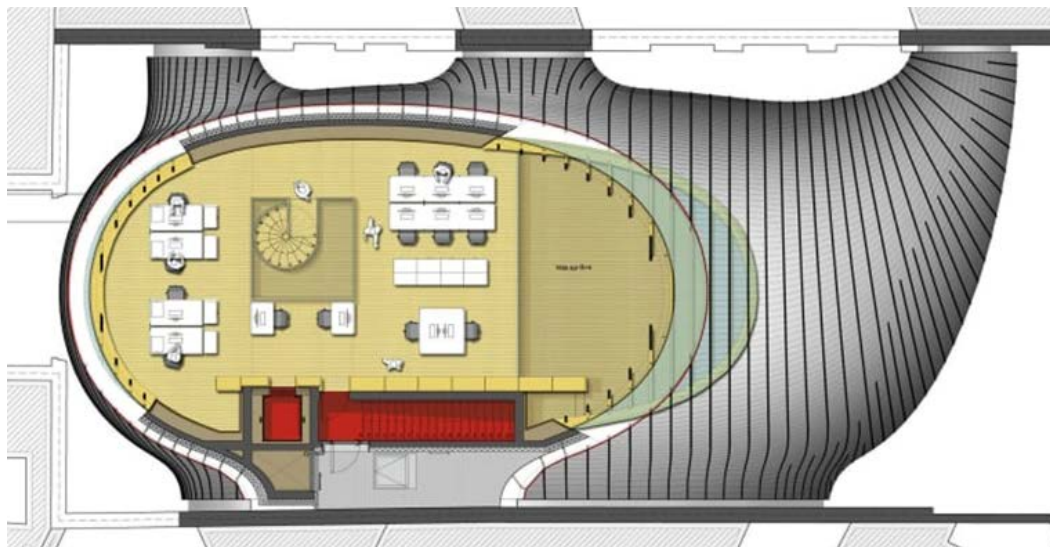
Pathe Foundation, Renzo Piano, Paris, France: Fifth Floor Foundation (10)
